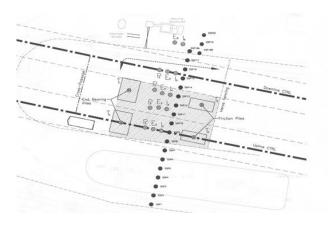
Field monitoring of ground and full-scale pile response to tunnelling in conjunction with Channel Tunnel Rail Link Project (site at Dagenham)
